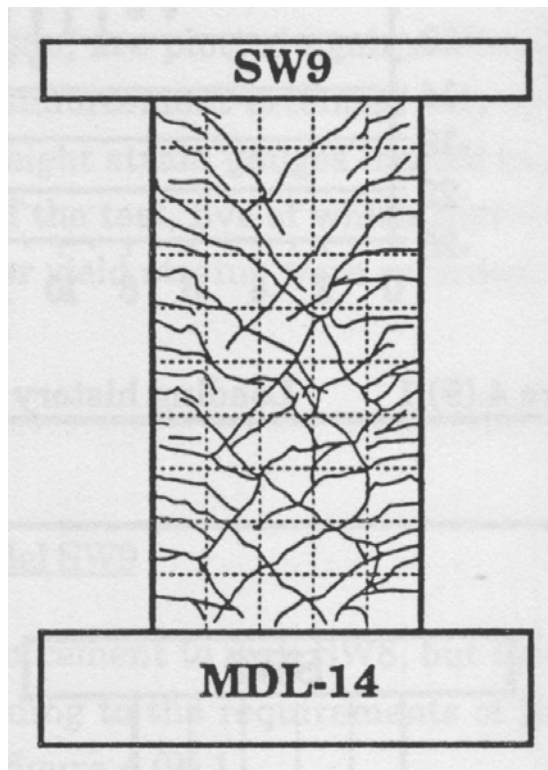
Condition of wall SW9 at 1.17% drift [Pilakoutas (1991)]
